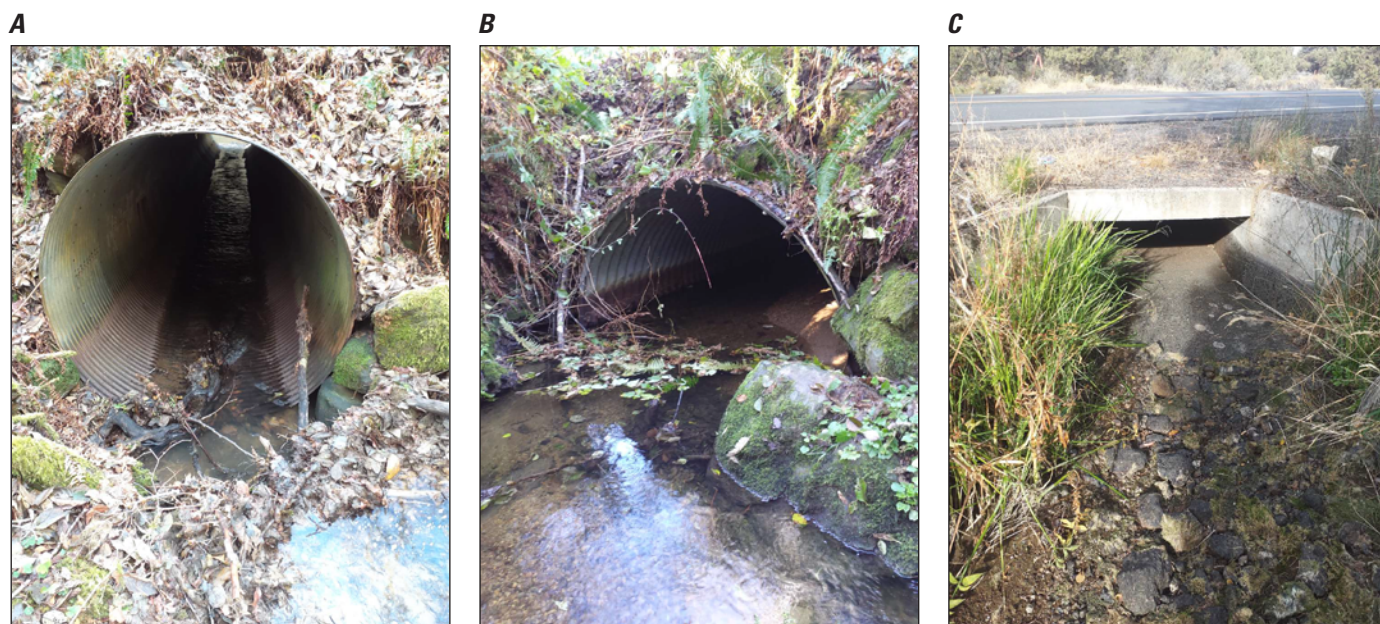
Images of three common types of culverts. Culvert *A* is a round pipe culvert constructed of corrugated metal. Culvert *B* is a bottomless pipe arch culvert constructed of corrugated metal. Culvert *C* is a box culvert constructed of reinforced concrete. Images courtesy of RoadXStr (a road-stream crossing database), Emily Heaston, U.S. Geological Survey.
